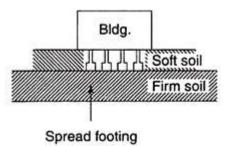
When the firm soil is near ground surface a feasible means of transferring the concentrated loads from the walls of columns of building buildings to the soil is through spread footing
